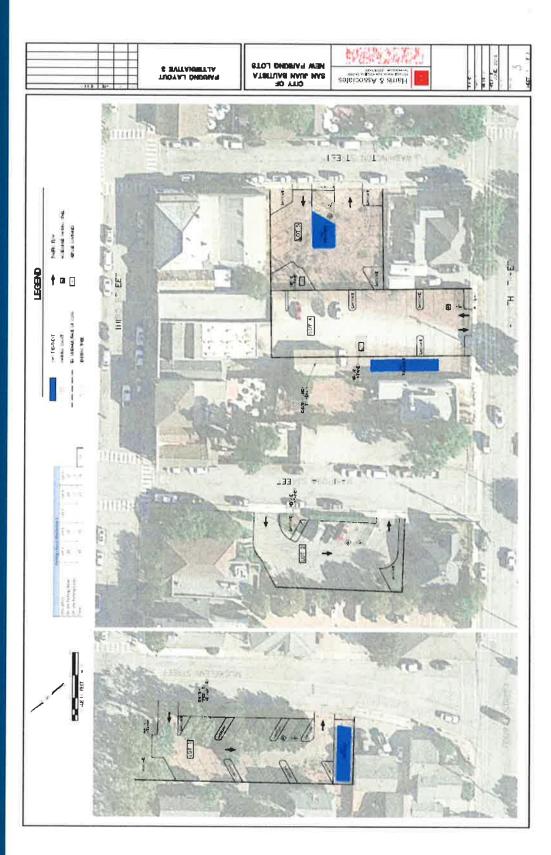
# EXHIBIT B – DOWNTOWN PARKING ALTERNATIVE #2
